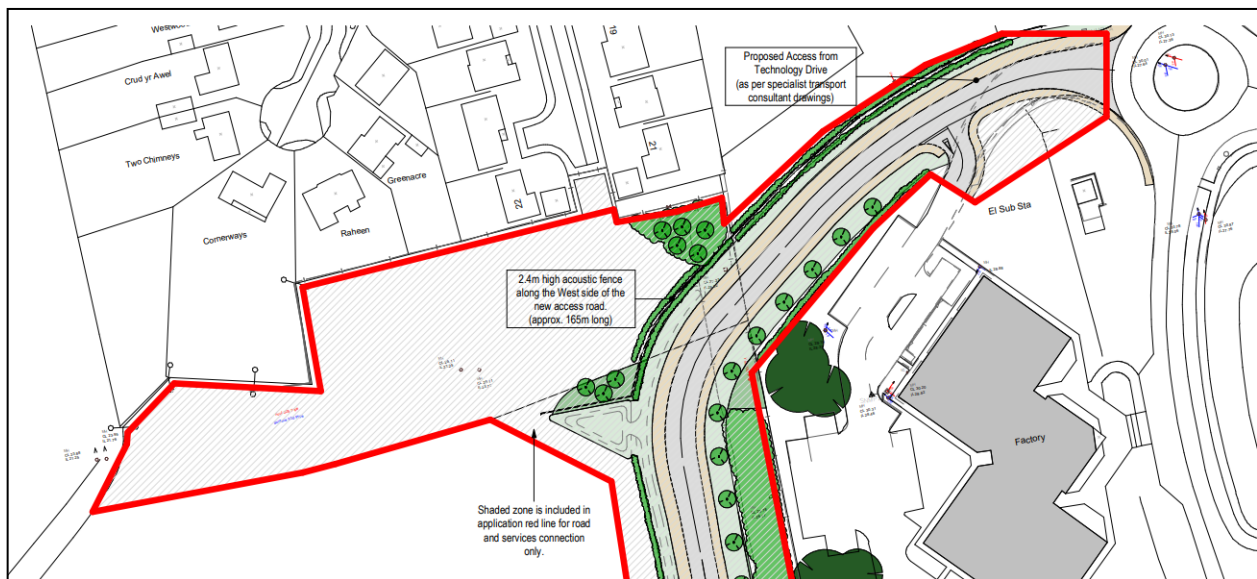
Extract of Plan Showing relationship of access road To Island Farm Close and Island Farm Road
